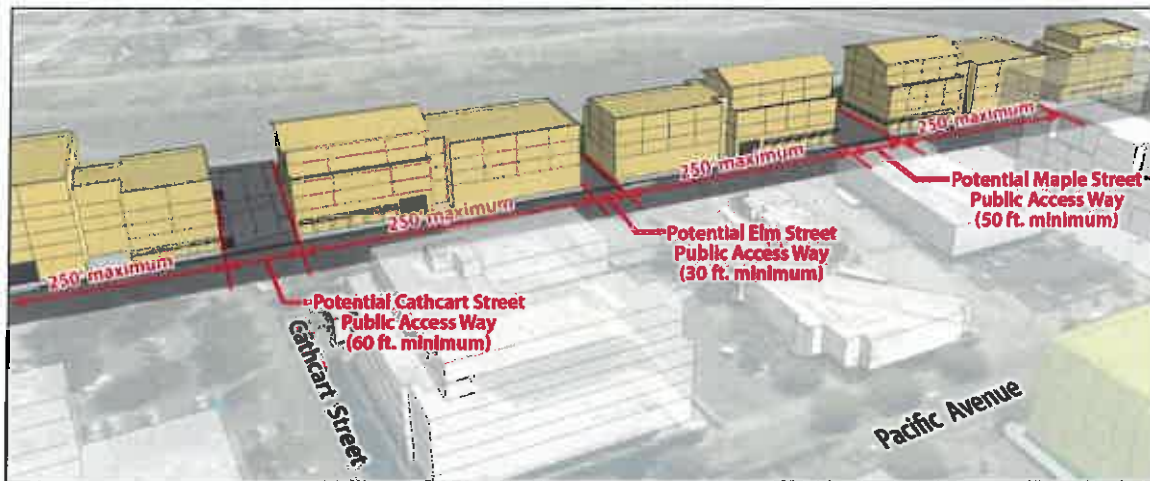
Proposed building massing and public access requirements along Front Street and the riverfront.
